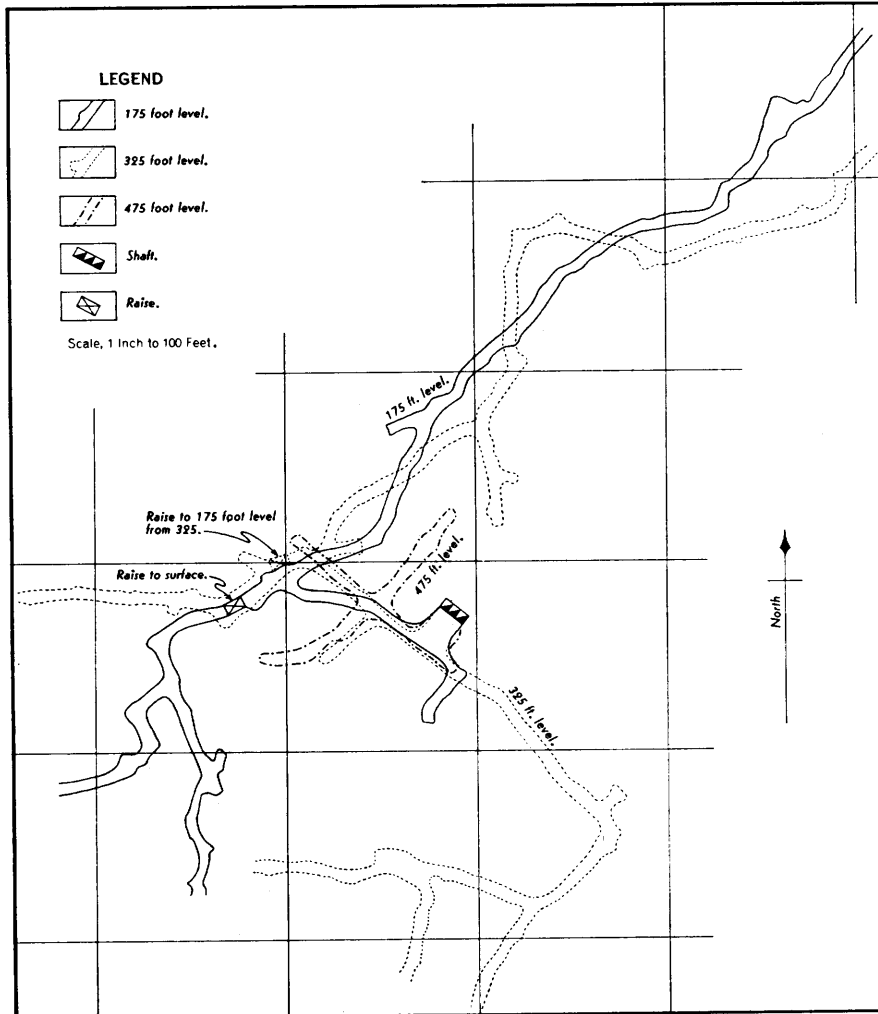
Plan of the underground workings of the Beanland mine. (From plans by D. M. Briden.)
